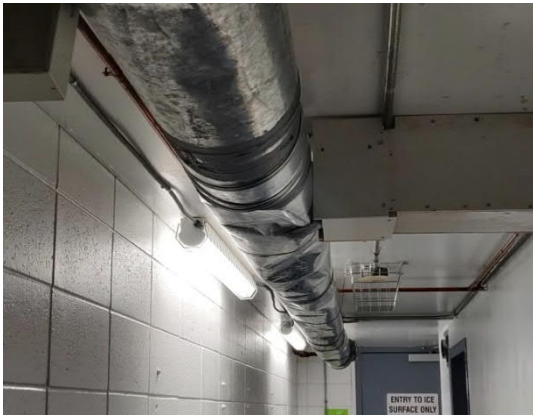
Damaged Ductwork in Locker Area Corridor & Disconnected Duct to Referee Room
